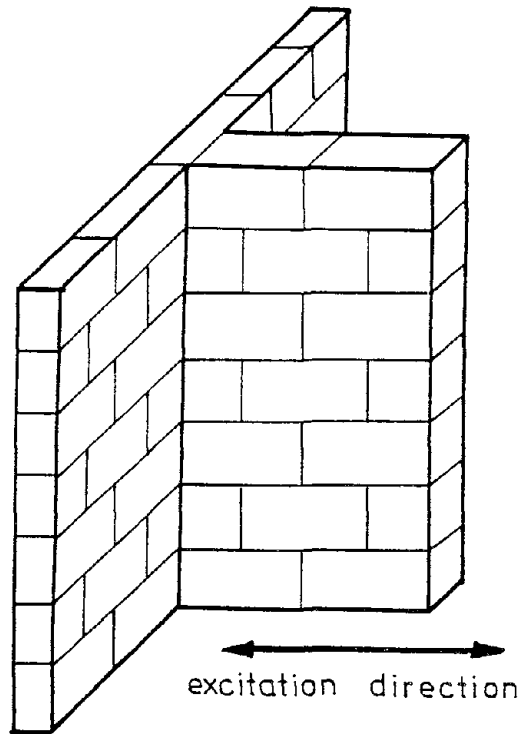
T-SECTION WALL EXCITED PARALLEL TO WEB
